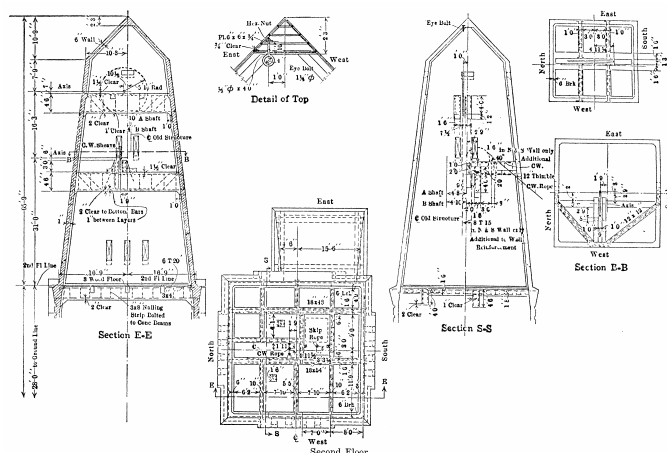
PLAN AND ELEVATION A SHAFT HOUSE
